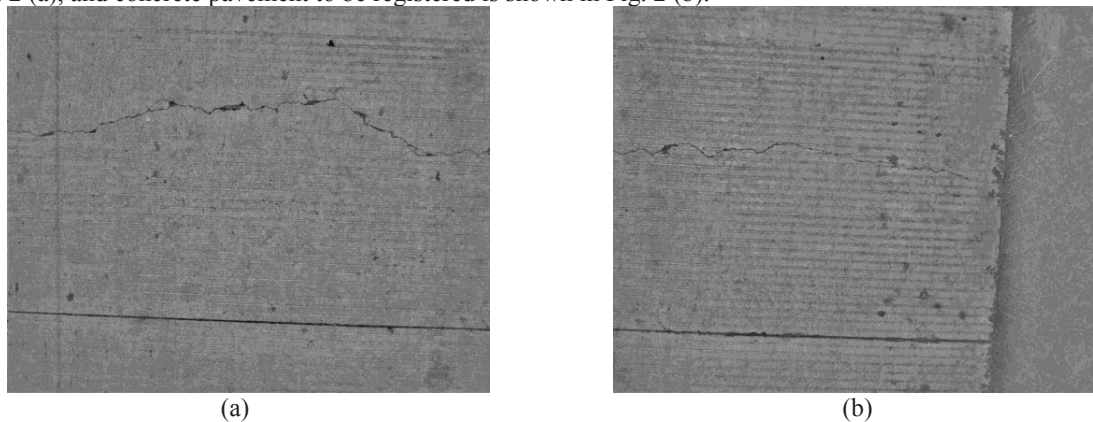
(a) Concrete pavement for reference; (b) Concrete pavement to be registered
